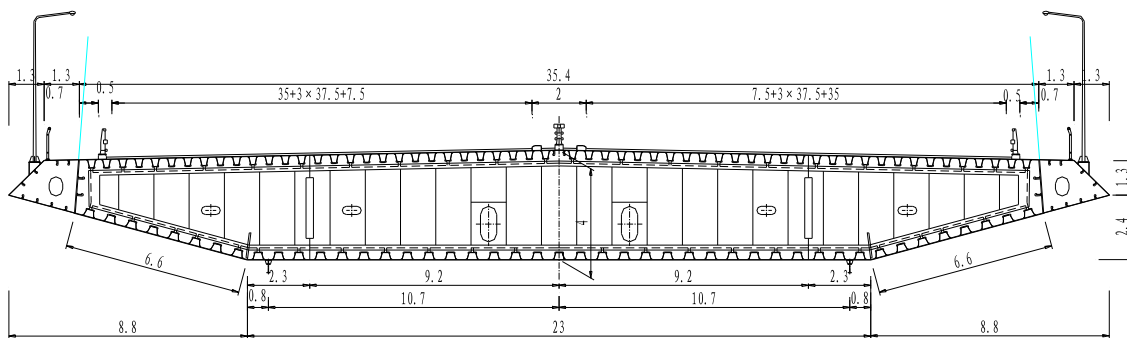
Deck cross-section of Sutong Bridge (Unit: m)
